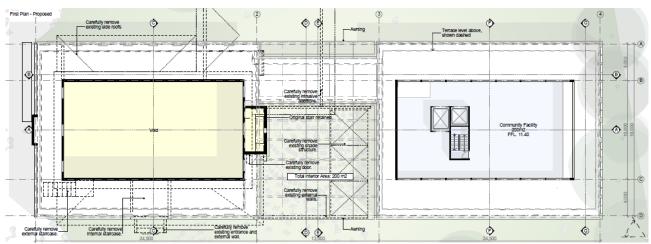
Proposed first-floor plan. Source: Lockhart-Krause Architects, 2021
